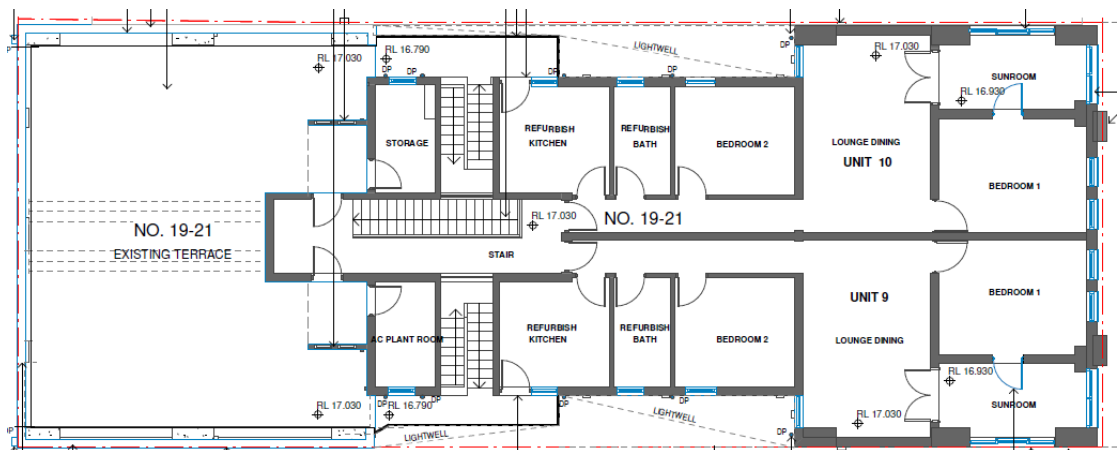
Proposed third floor plan. (Source: NBRSArchitecture)
